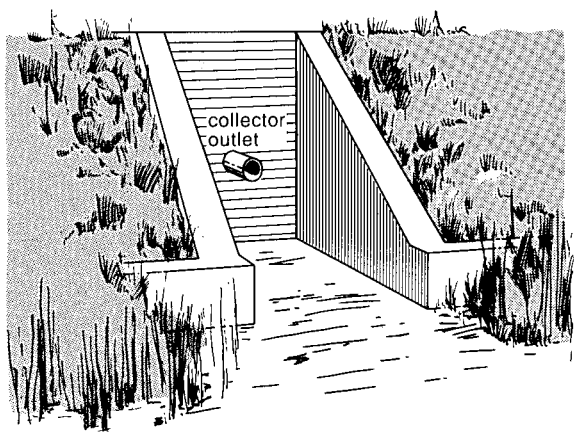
Collector outlet in recessed area (SCS 1971)
